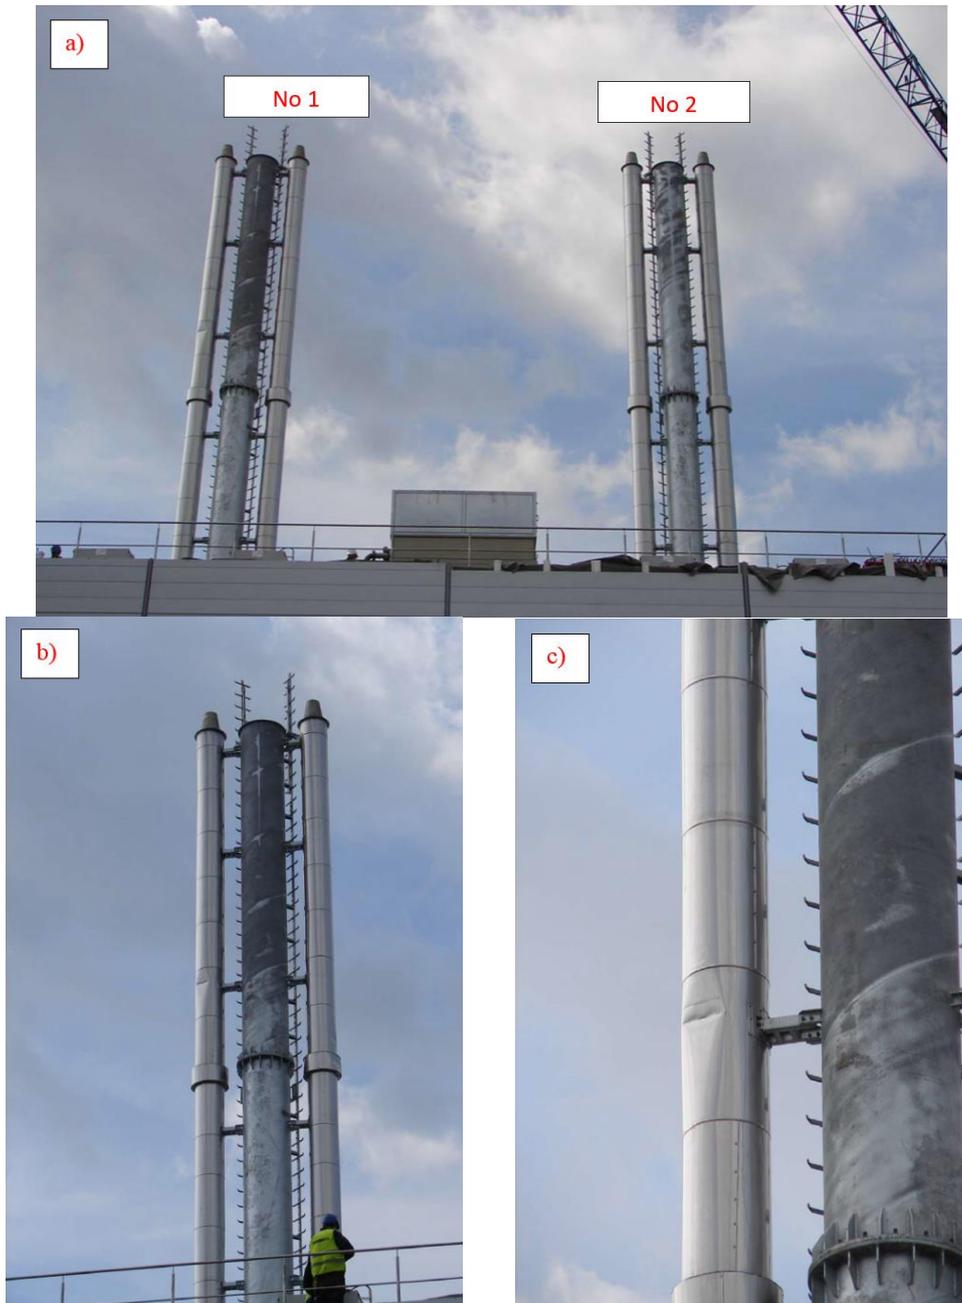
a-c. Steel assembly of the chimney stack's load bearing shaft, together with flue gas pipes.
